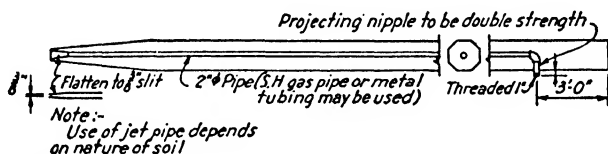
Standard Jet Pipe for Concrete Piles. (Courtesy of American Railway Engineering Association.)
